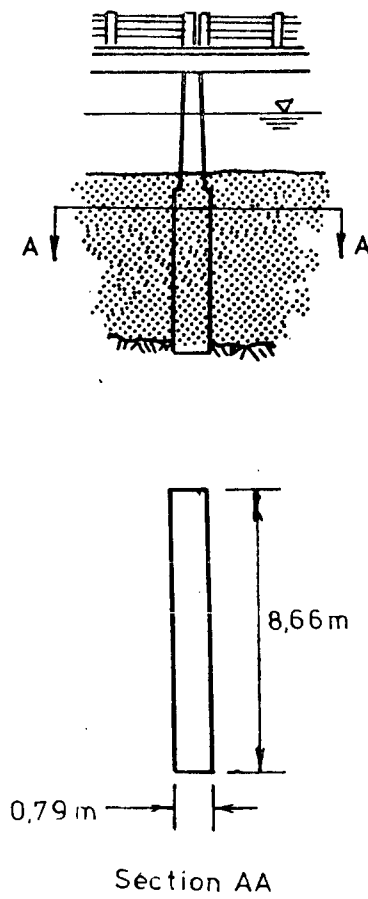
Niven's Drift Bridge - Pier & Foundation Details
